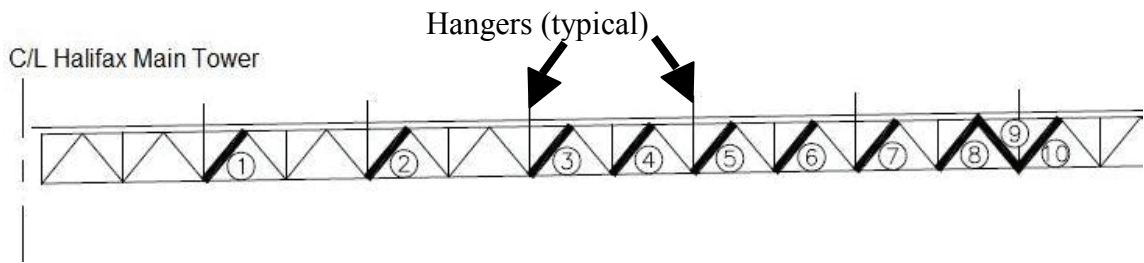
Longitudinal stiffening truss profile (adapted from B&T)
